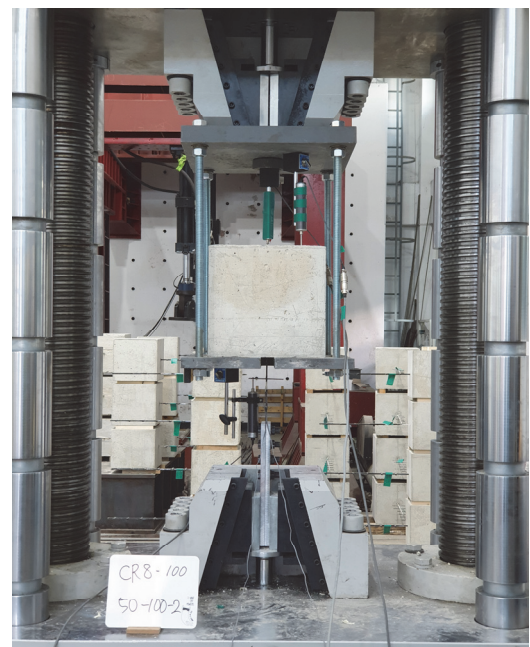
Direct pull out test setup of grid type CFRP reinforcement
